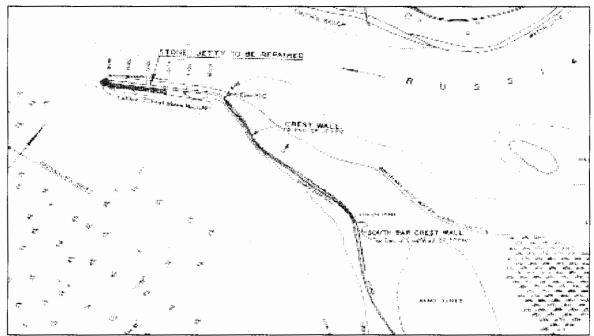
Layout of Narrow Gauge Rail System (Northern Portion)
